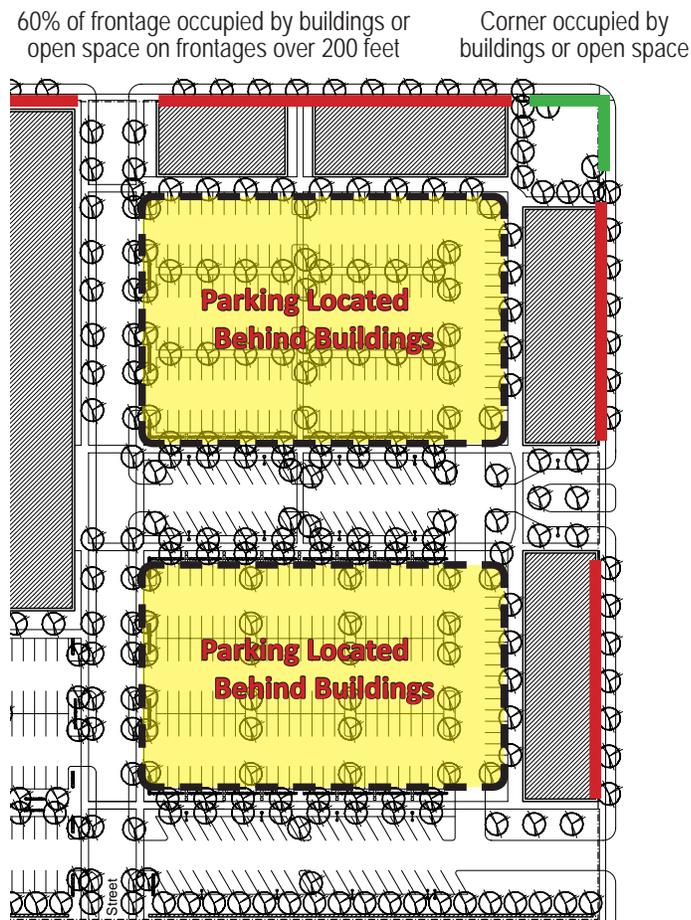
D.2.B: Open spaces located at the street may count toward frontage requirements.
